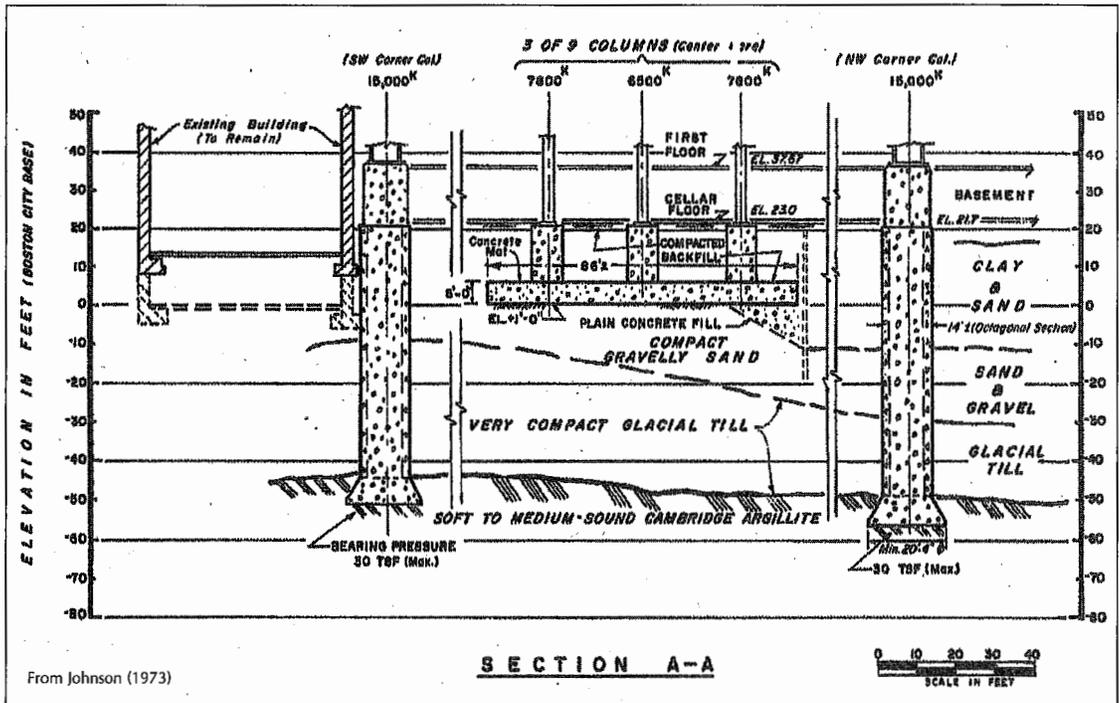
Typical geology and foundation geometry and column design loads for the Boston Company Building (view west).
